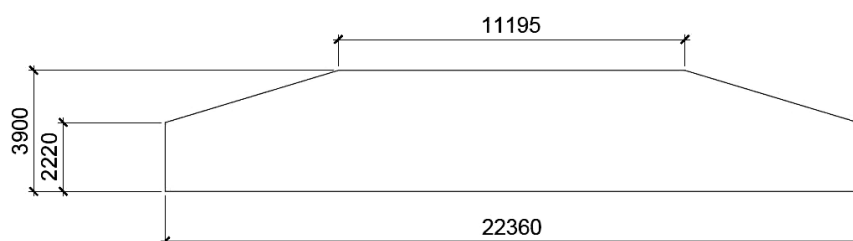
Suggested cross sectional diagram of poultry house structural dimensions
